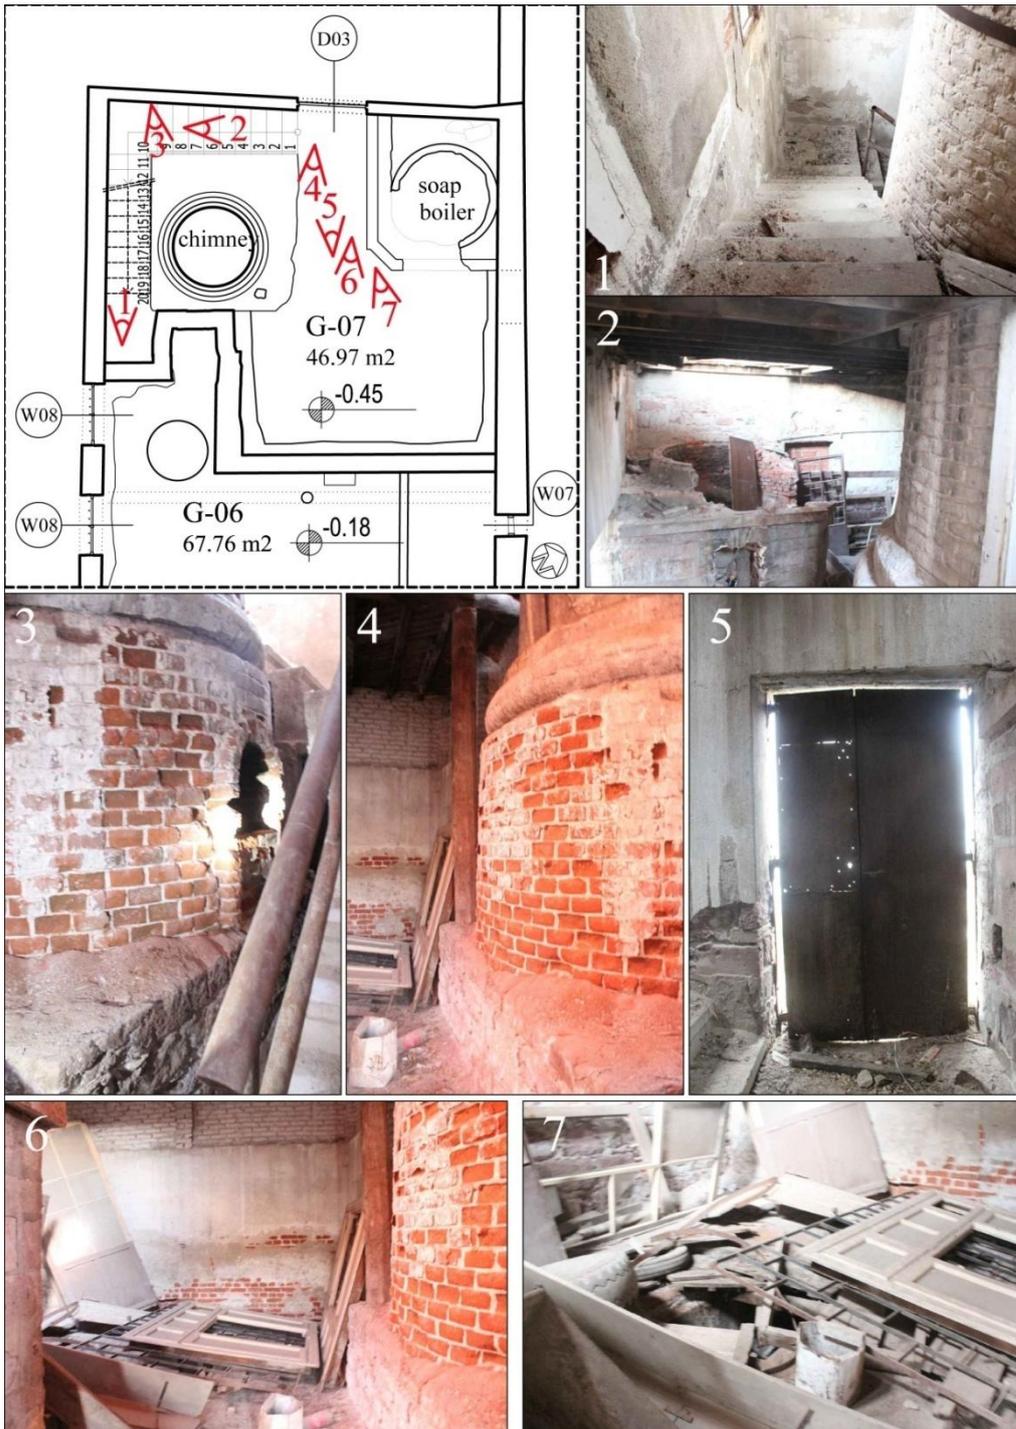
Space G-07; photograph key plan, 1:The concrete stairs; 2:Soap boiler and its base; 3-4:Chimney; 5:Double-wing iron door; 6:The view of the south-east wall of the space; 7:The view of the flooring.
